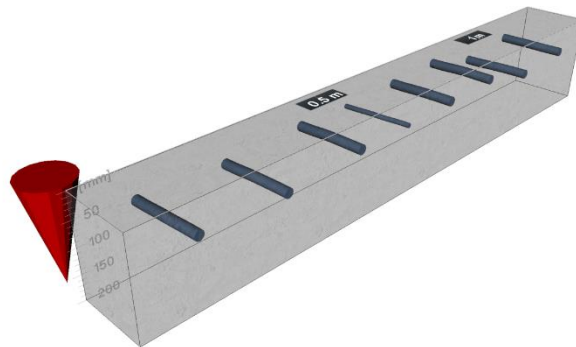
Rebar detection in scan-3 zone (diaphragm wall)
